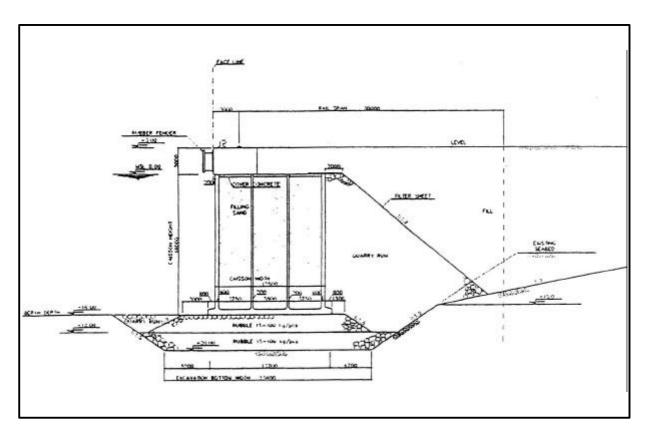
Proposed Cross-section : Concrete Caisson Type Quay Wall.
